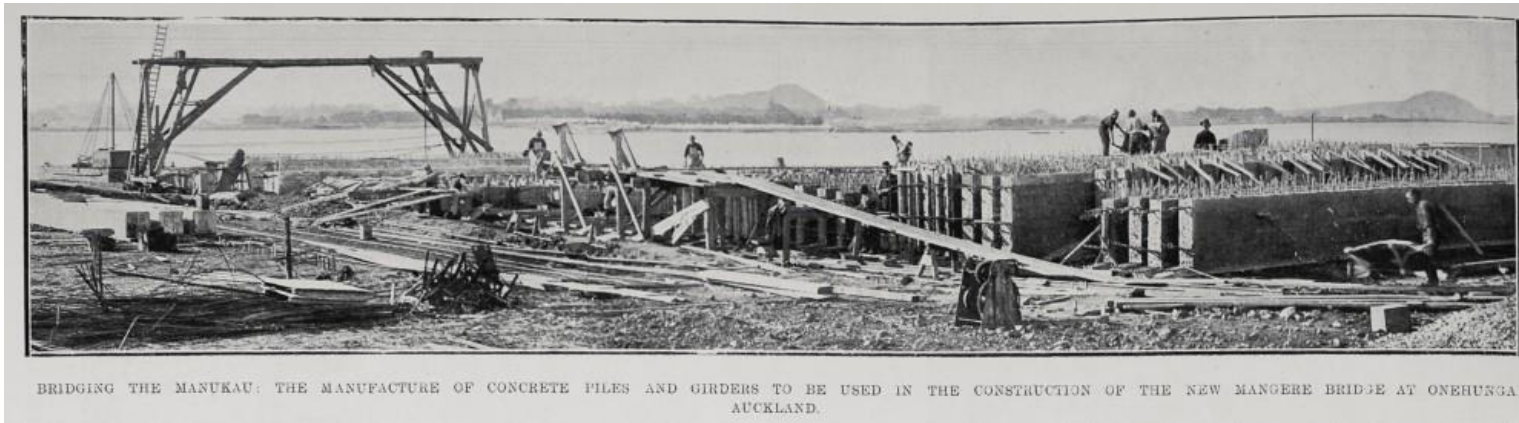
View of concrete piles and girders to be used in the construction of the new Māngere Bridge, Auckland Weekly News, 11 June 1914. Auckland Libraries Heritage Collections, AWNS-19140611-42-1.
